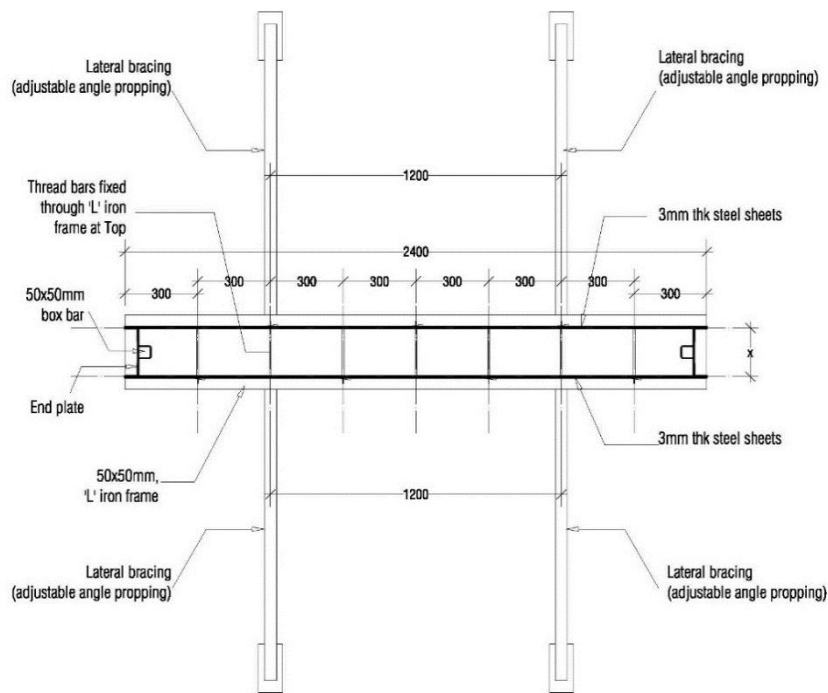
Formwork arrangement to typical wall segment – PLAN VIEW
